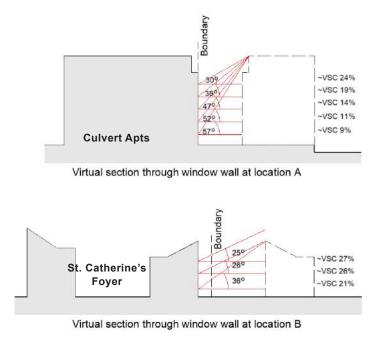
Sections indicating existing and hypothetical obstructing angles to the surrounding areas
